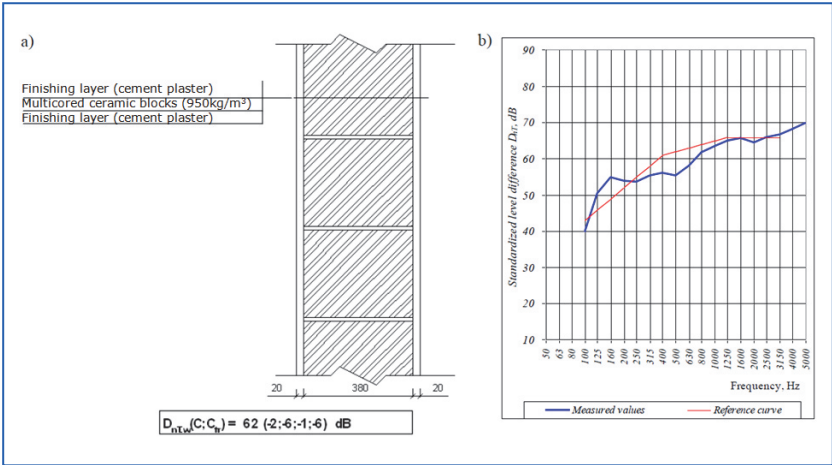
Separating heavyweight single wall: a) cross-section of the wall, b) graph view of standardized level difference values.
